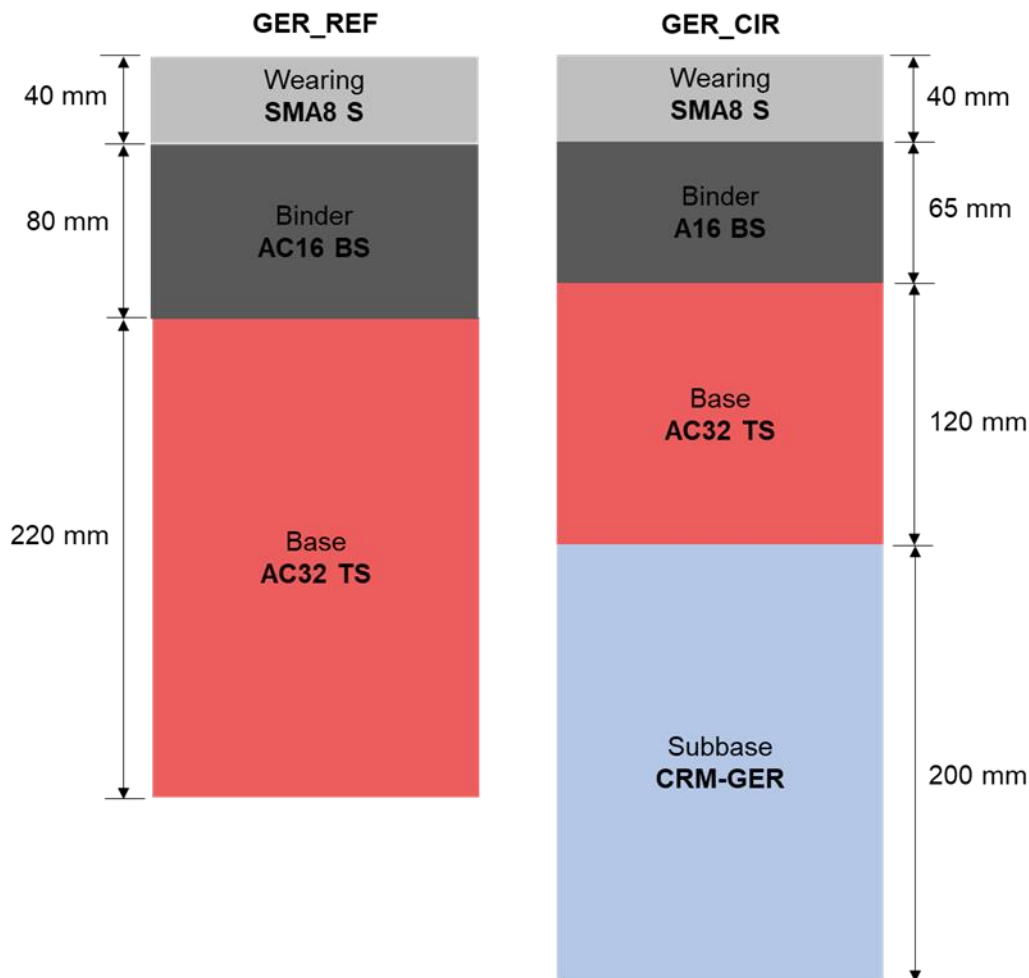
Pavement structures considered for the German case study: reference pavement and pavement with CRM
